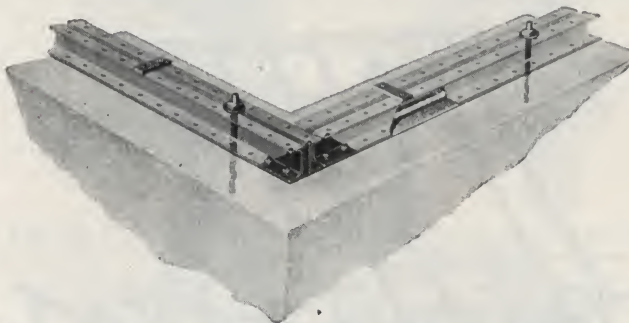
Sills Bolted at Corners, Levelled and Grouted with Cement
